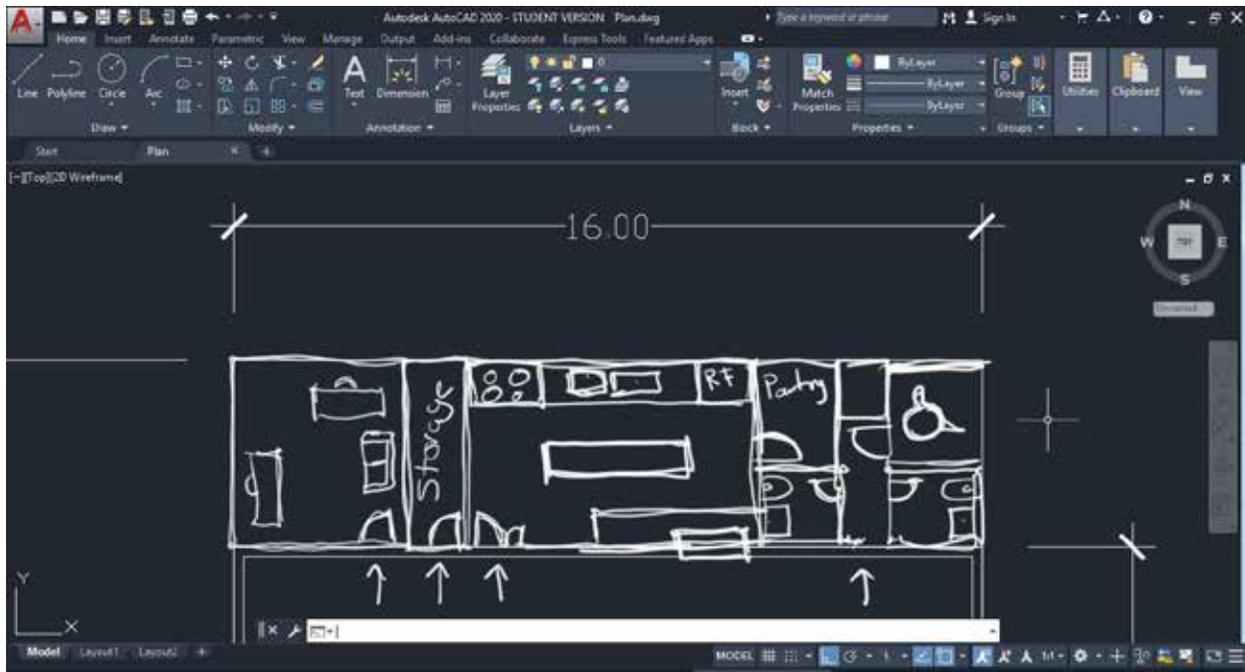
Hand-sketched schematic layout of the plan in AutoCAD
